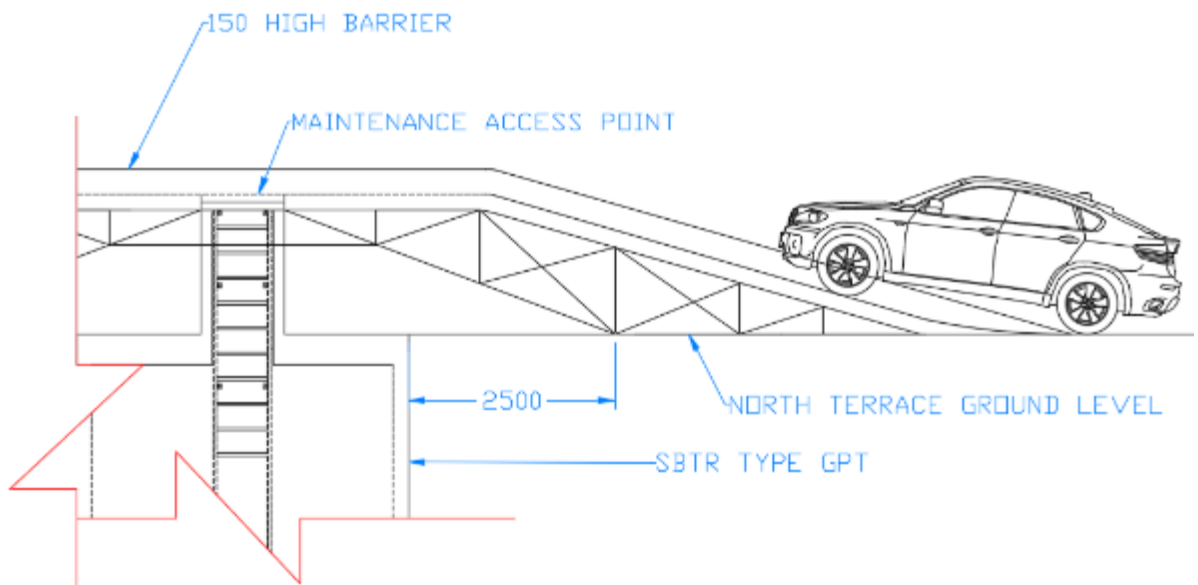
GPT Bypass Design Drawing (Hydro-Future Consulting, 2015)
